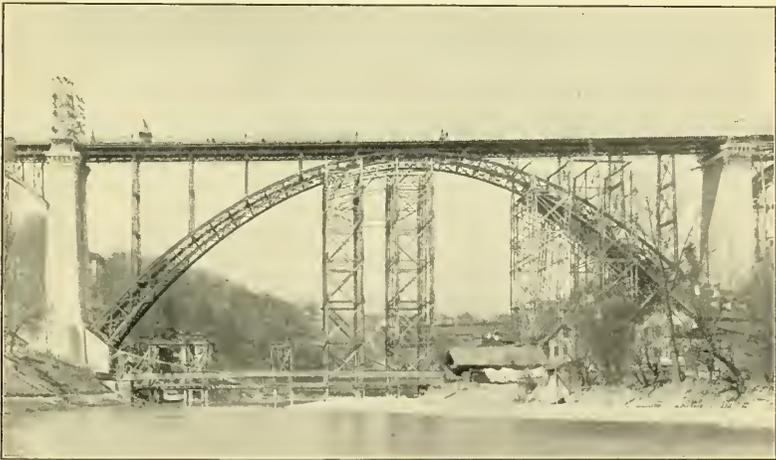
ERECTION OF THE KORNHAUS BRIDGE.
